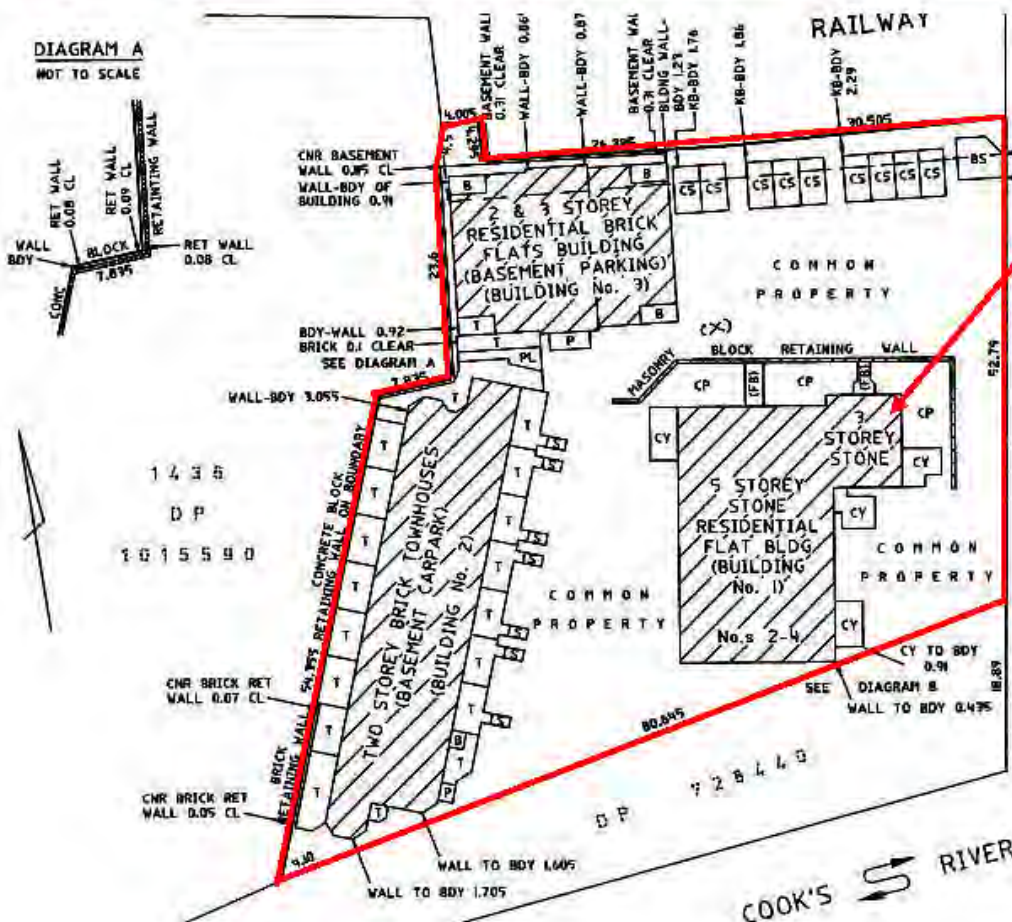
Site plan of the contemporary Sugar House apartment complex. (Source: SP.70958 plan of title, NSW Dept of Lands)
